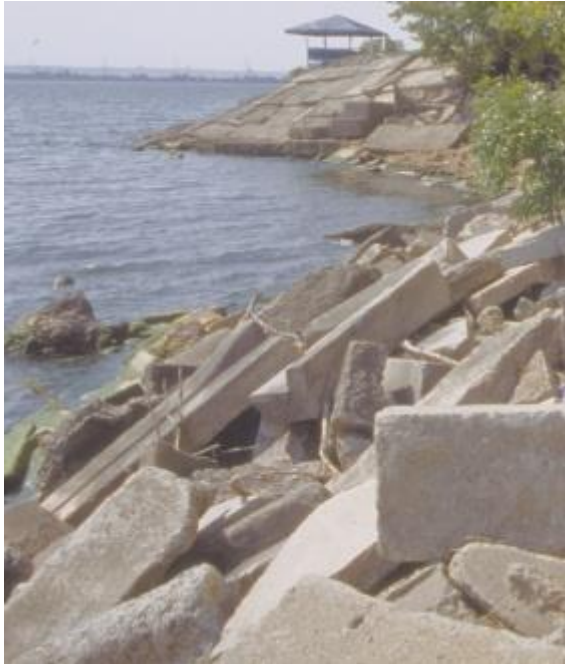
Used chunks of concrete appear to have been employed in the foreground as coarse fill, while concrete slabs seem to be applied in the background to plaster the slope as protection against waves. Source: <http://www.dfo-mpo.gc.ca/regions/central/pub/fact-fait-mb/mb3-eng.htm>.
